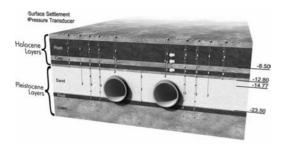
Sophia Rail Tunnel, soil stratification and location of extensometers at the measurement location (picture Arne Bezuijen).
